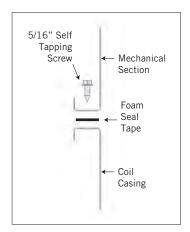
Mechanical/Coil Casing Assembly for Optional Three-Piece Rigging
